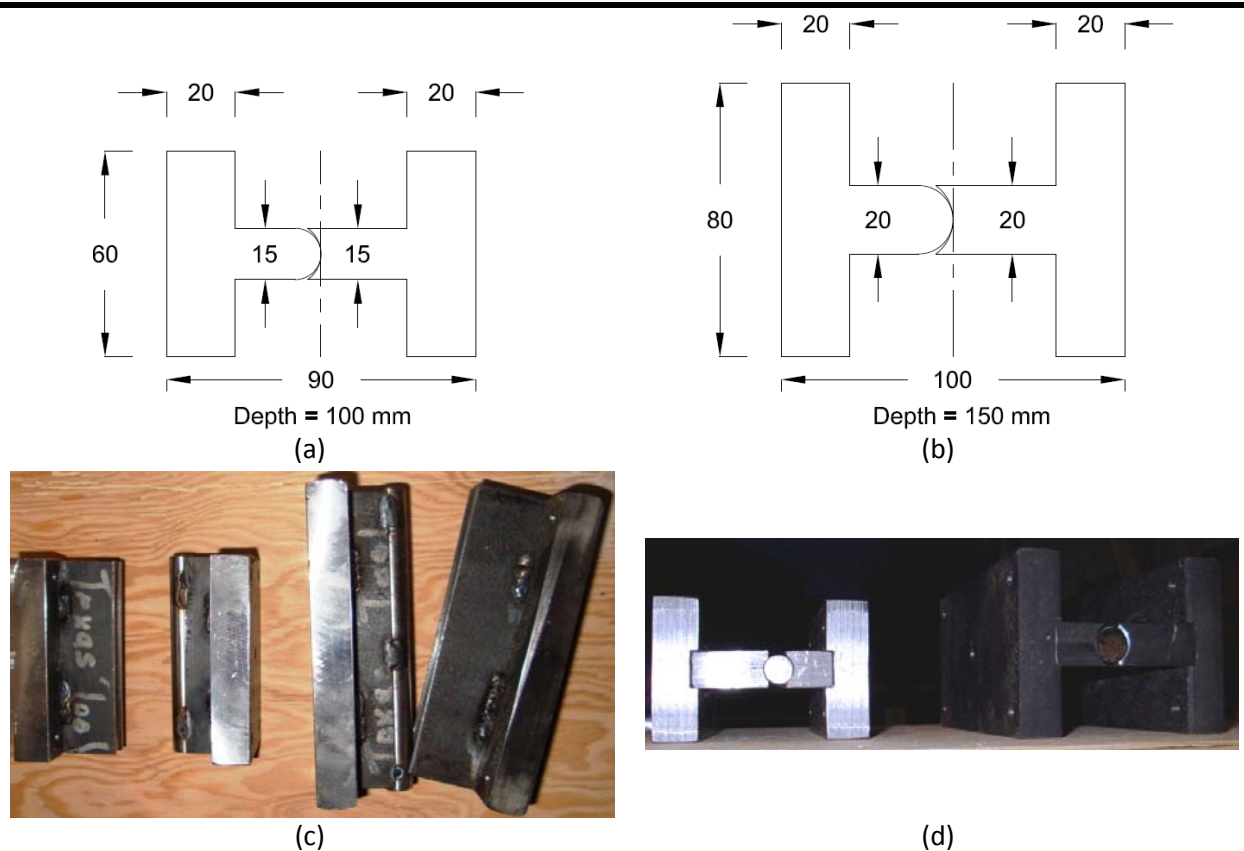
Beam specimen hinges: (a) Type A hinge; (b) Type B hinge; (c) top view; (d) elevation view.
